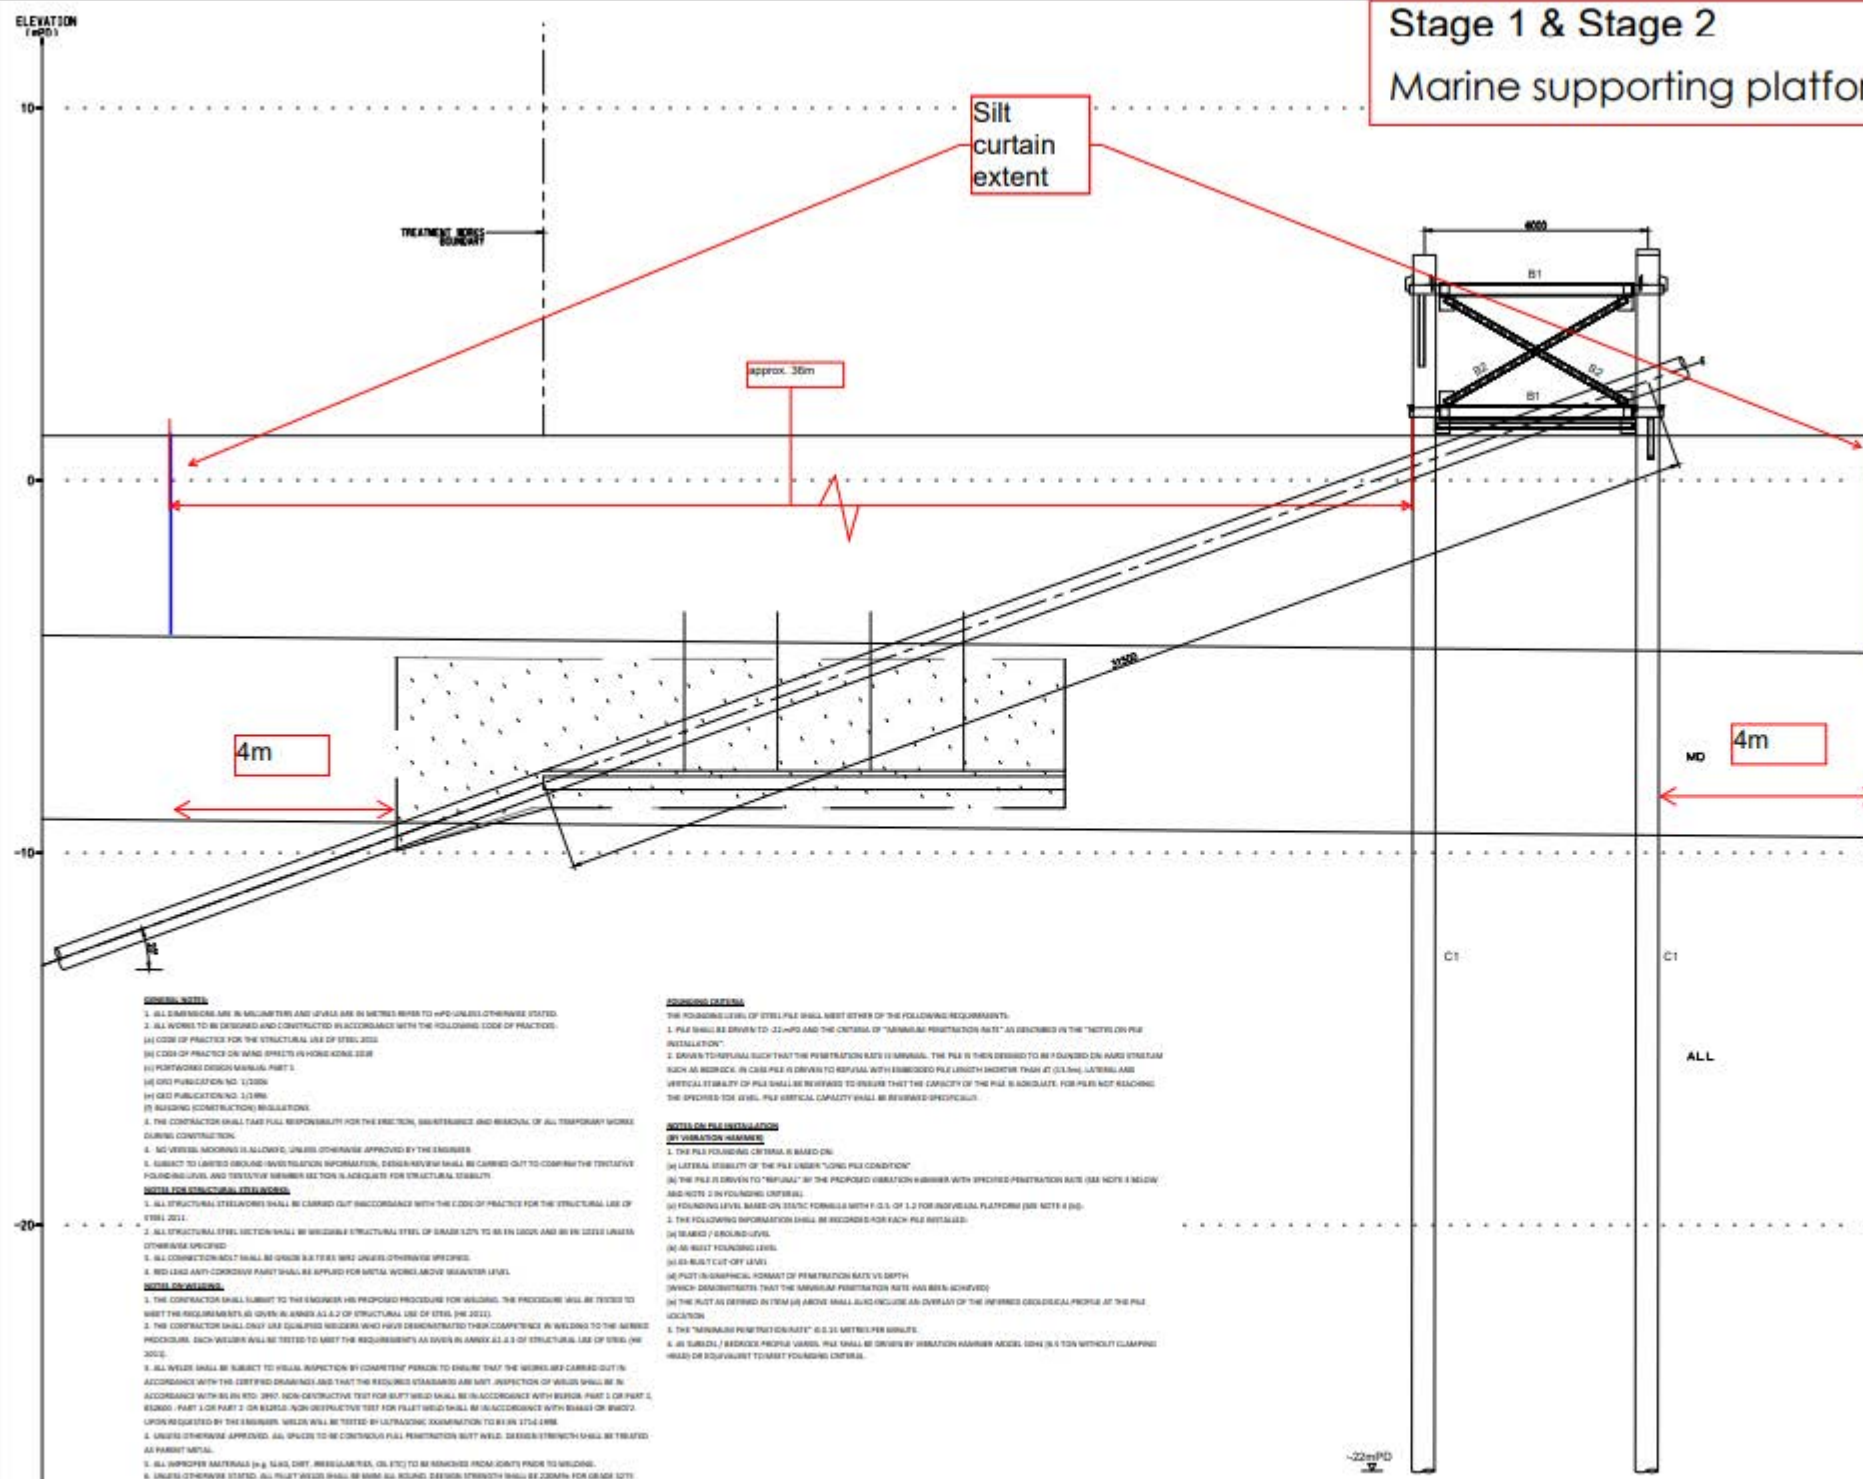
Typical Details of Proposed Silt Curtain (2 of 4)
